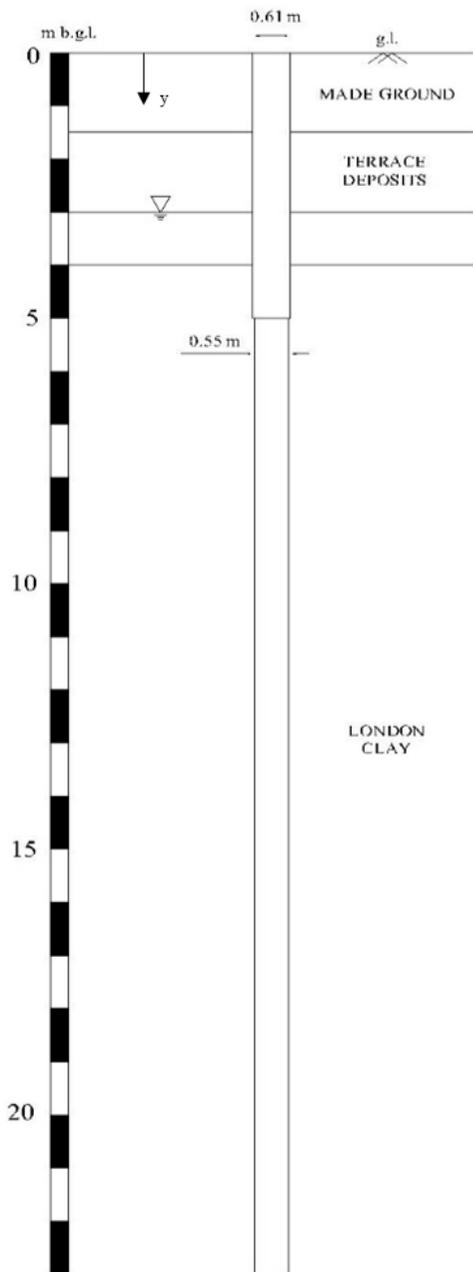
Sketch of the Lambeth College test energy pile and soil stratigraphy
